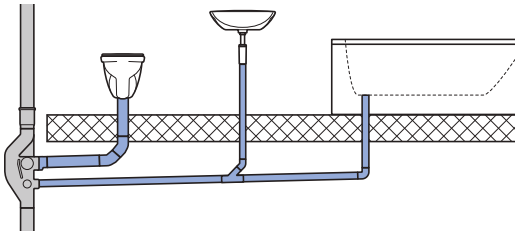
Structure with single branch discharge pipe and collector branch discharge pipe under the ceiling
